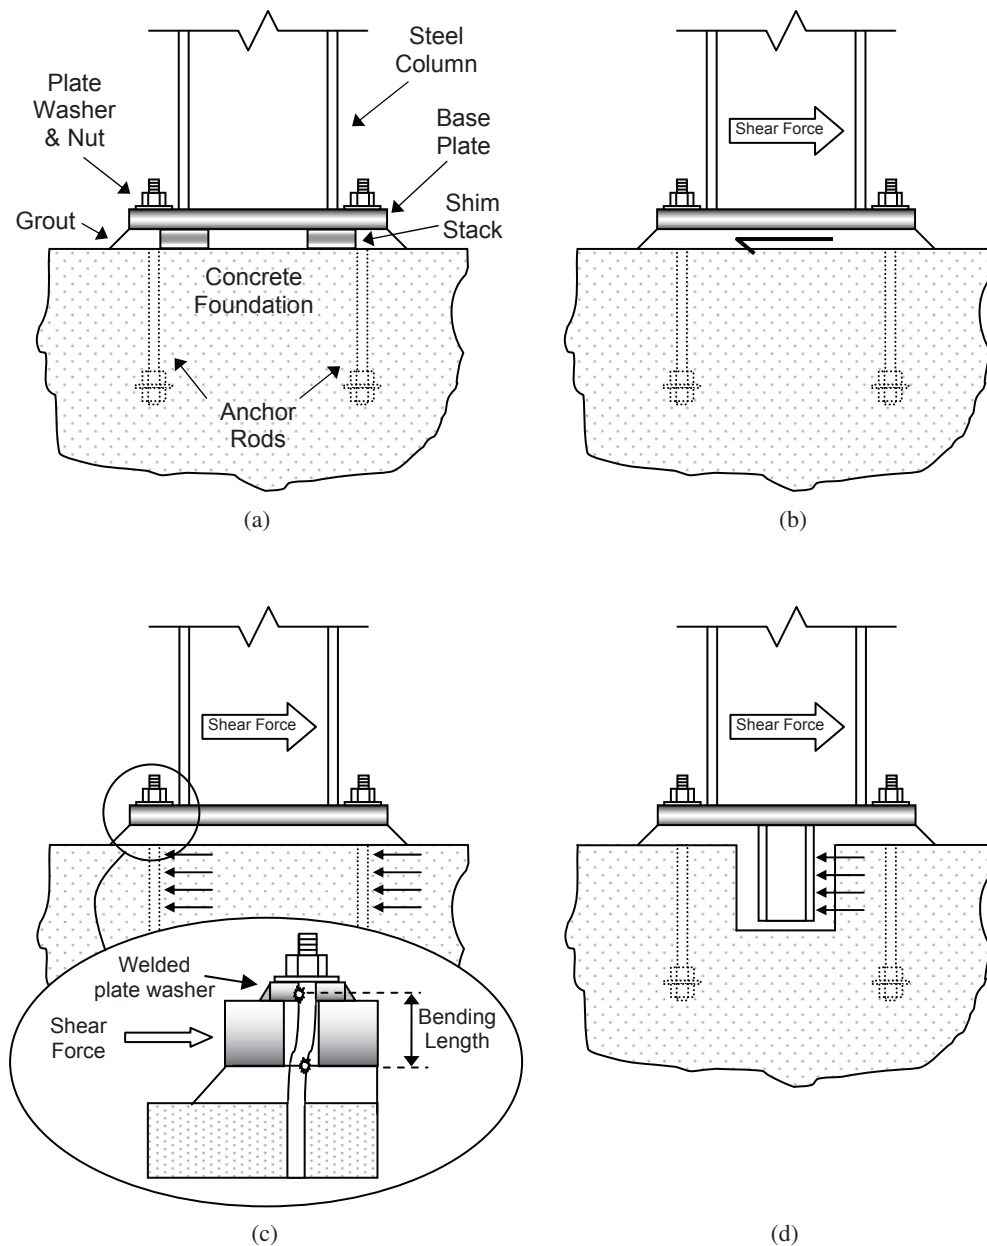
Typical exposed column base connections and associated shear transfer mechanisms: (a) base plate detail; (b) surface friction; (c) anchor rod bearing; (d) shear key bearing. (Adapted from the 2005 AISC Seismic Provisions)
